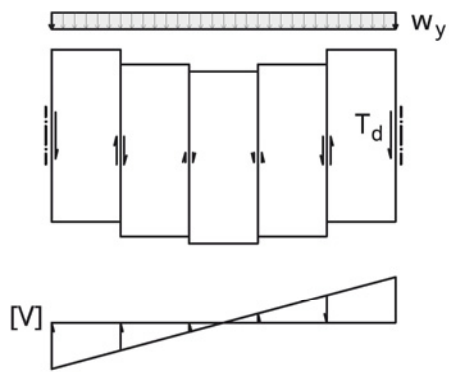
Floor plan of a ceiling span with bracing shear walls and wind impact
